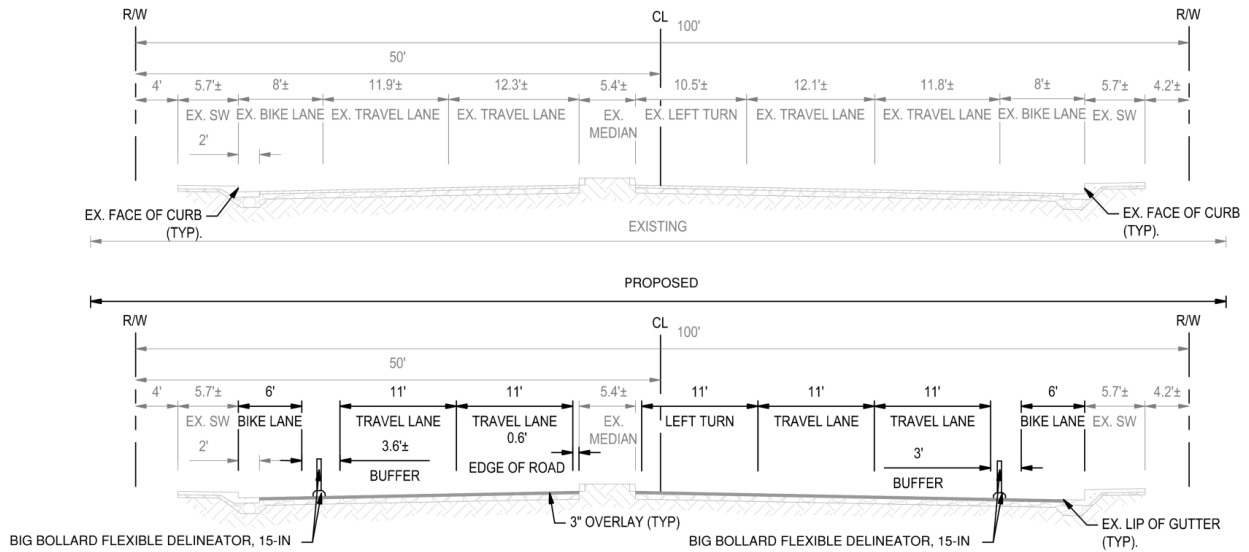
Typical cross section (Moffett Boulevard to Whisman Road)
